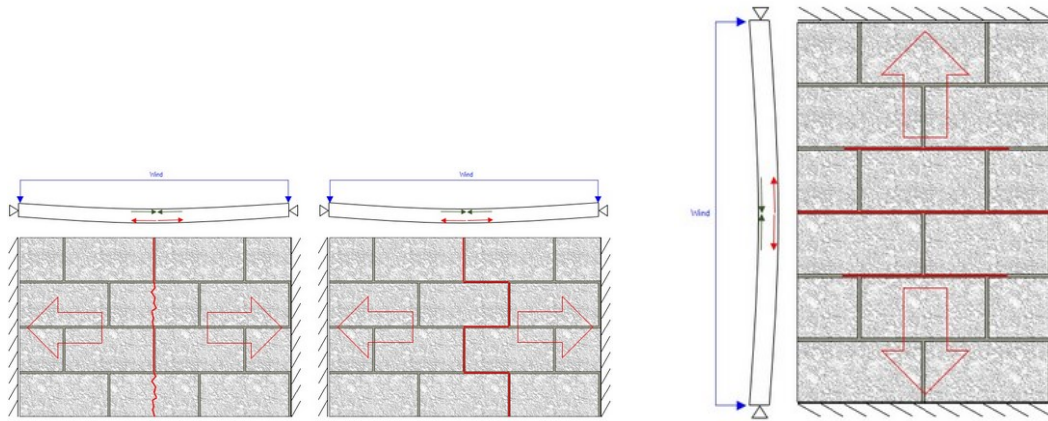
Crack development in a) horizontally spanning and b) vertically spanning walls(Canada Masonry Design Center, 2017)
